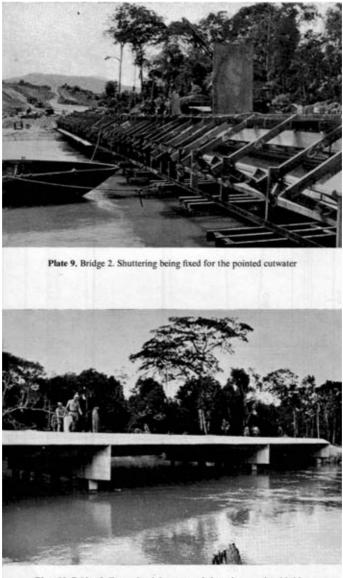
, Bridge 2. Expansion joints are sealed on the completed bridge
